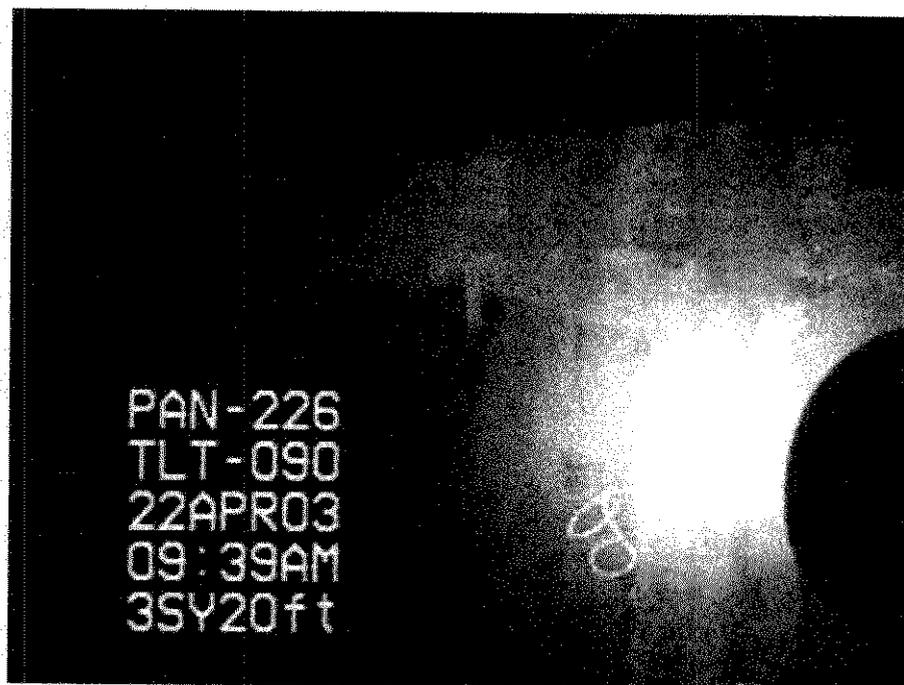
SY-103 Riser 40, Primary Tank, Construction Marks/Horizontal Weld (2003)
